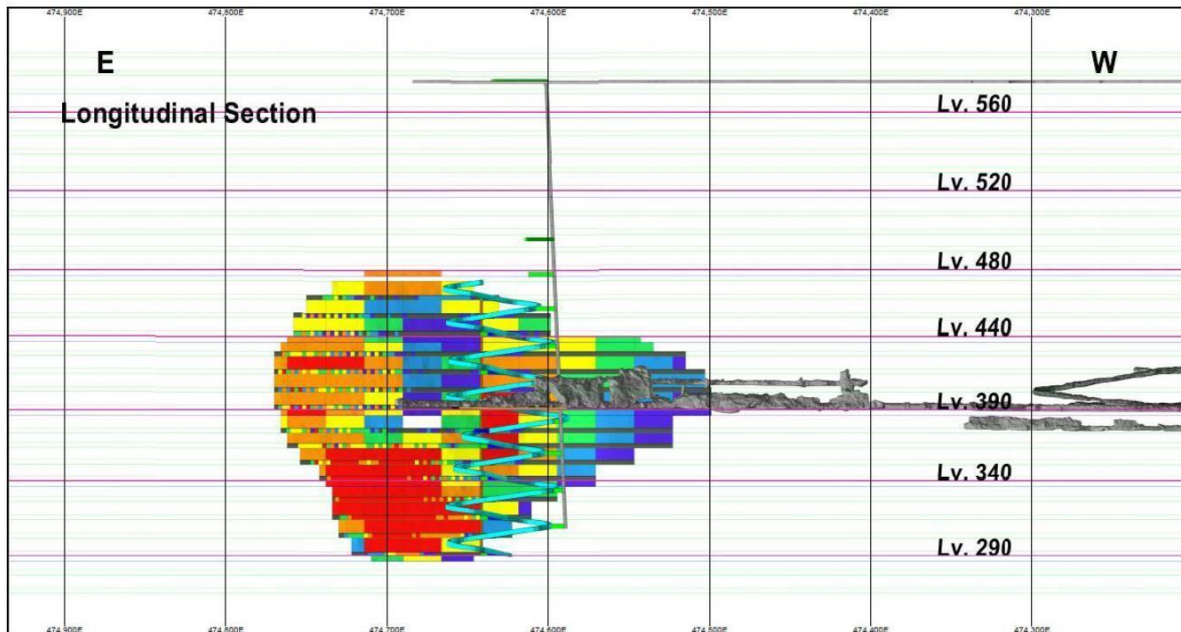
Longitudinal section, Natividad Vein. Source: SMR 2024
